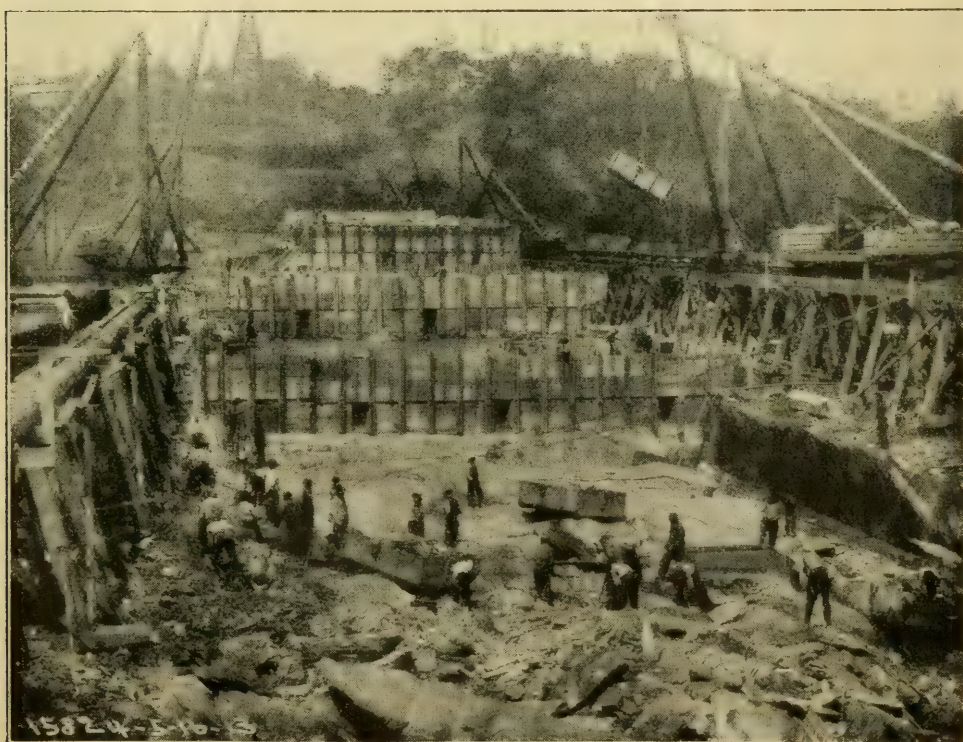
GENERAL VIEW, SHOWING METHOD OF HANDLING WORK AND TYPE OF WALL FORMS USED.
